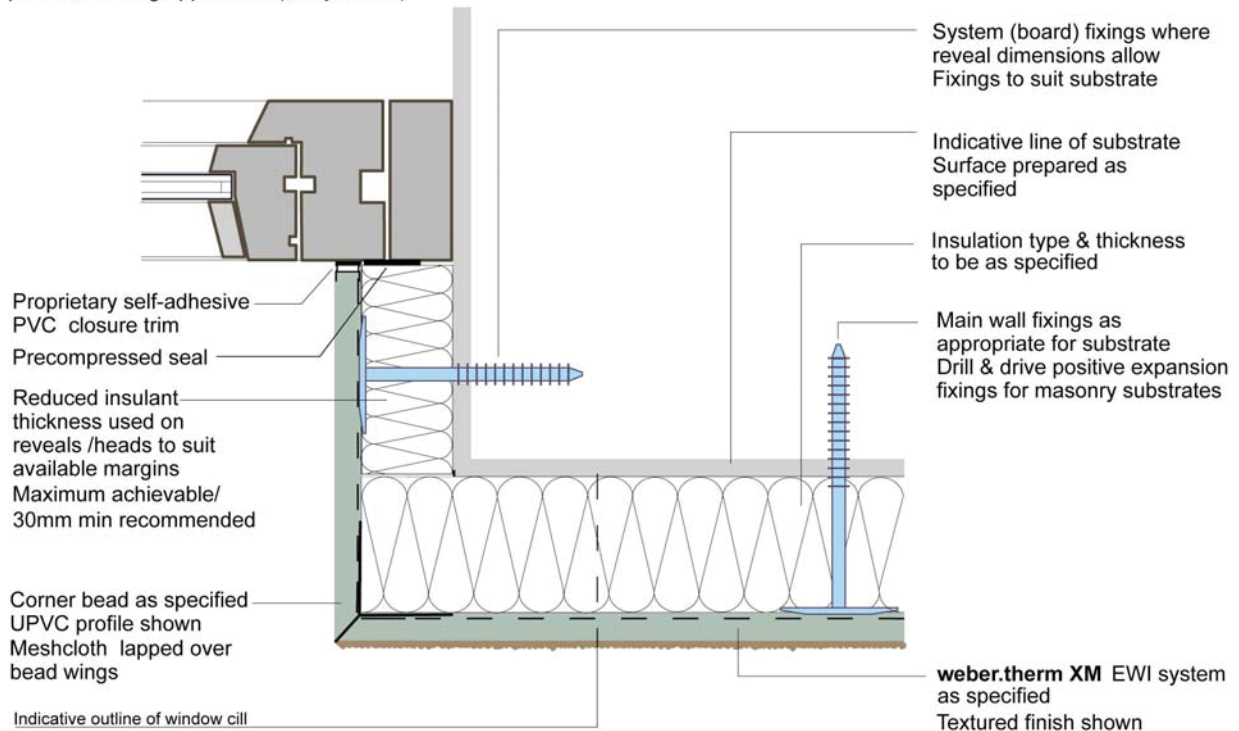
Detail Plan – Thin Board Reveal (Frame Seal)
